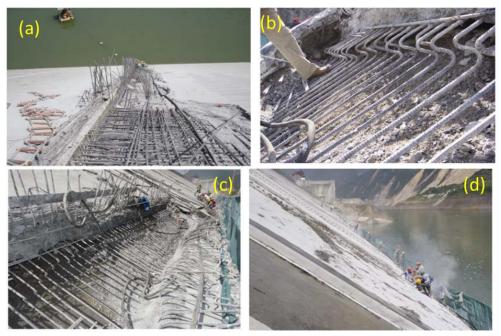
Dislocation of the horizontal construction joints of the slabs. (a) excavation of the damaged longitudinal joint of the no. 23 slab (after removal of the broken concrete). (b) the exposed horizontal joints at el. 845 m after local removal of concrete. (c) repairing the dislocated horizontal joints of the no.8 slab (the stress bar bended in "s" shape). (d) repairing construction of the damaged slabs.
